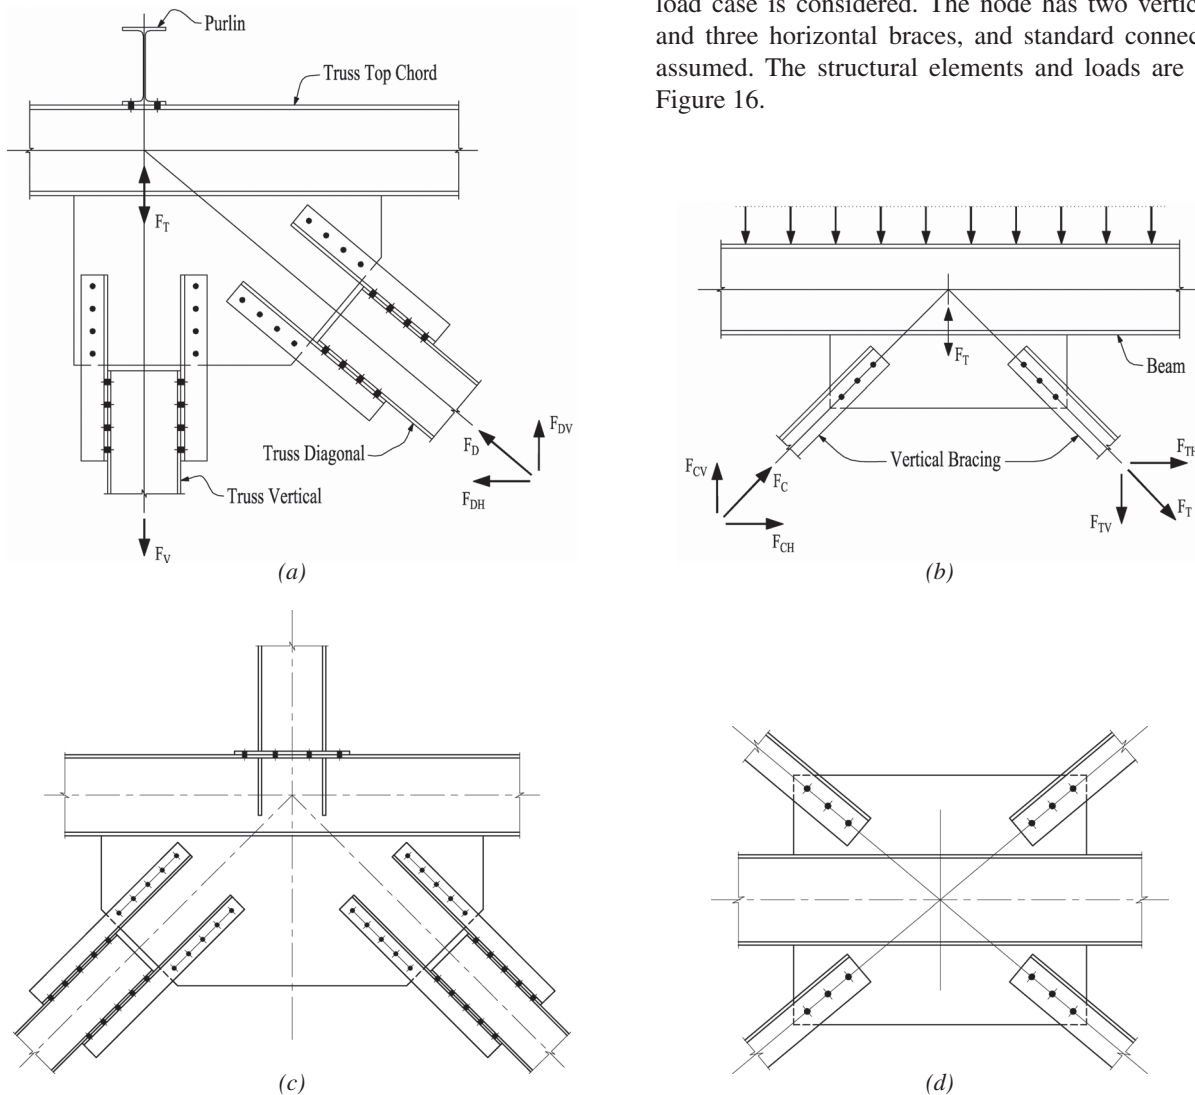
Joints with vertical transfer forces. (a) Truss panel point with purlin. (b) Inverted V-brace with gravity floor load. (c) Inverted V-brace with column above. (d) Mid-point of an X-brace.
